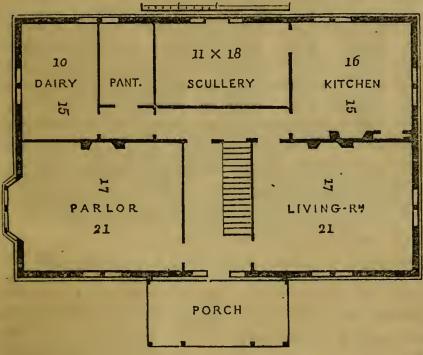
PLAN OF PRINCIPAL FLOOR.
